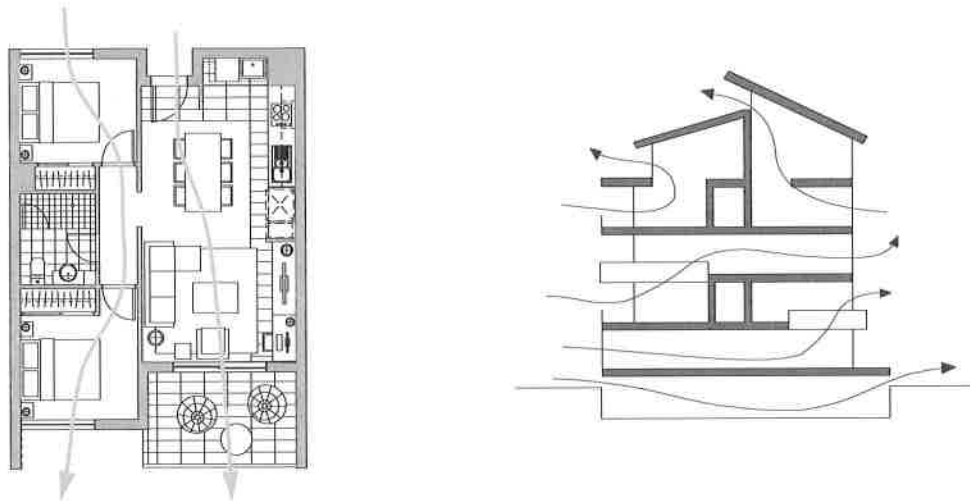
For habitable rooms enhance cross ventilation with openings on all external walls
